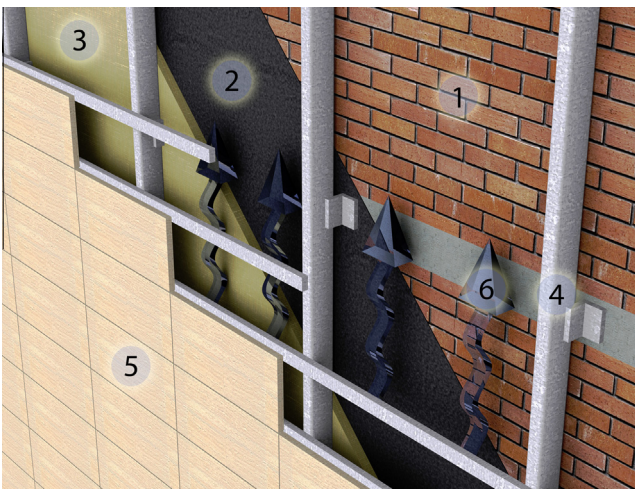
Image of layers of a ventilated façade system: (1) inner wall; (2) breathable and waterproof sheet; (3) continuous insulating layer; (4) load-bearing structure; (5) joined building wall; (6) ventilated air gap.
